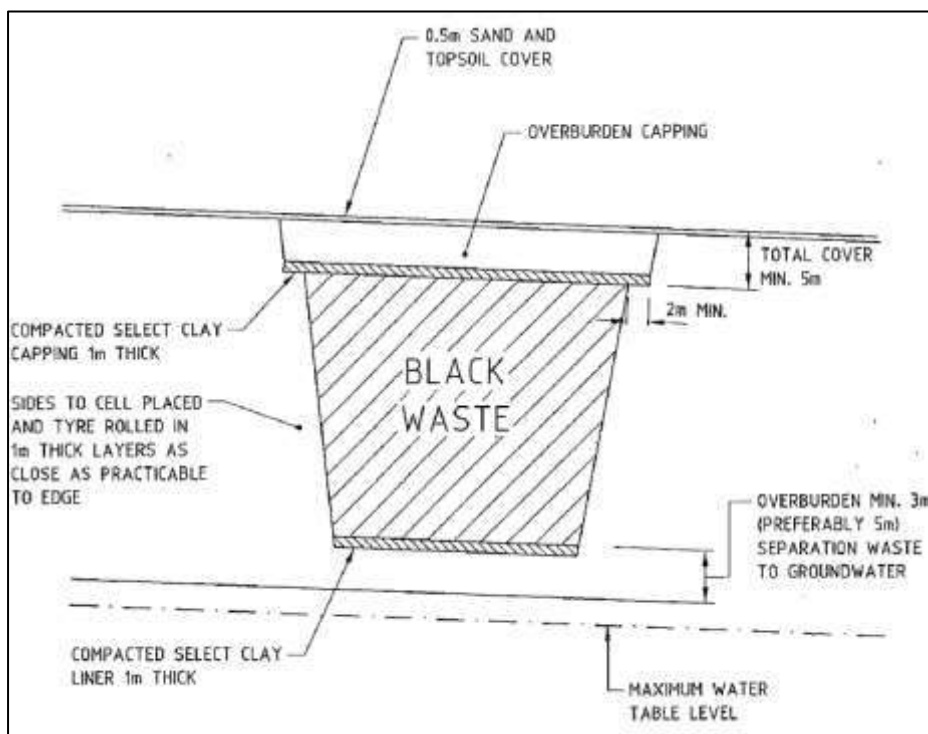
Pit construction details for waste pits 7 and onwards (HGM, 1996).
